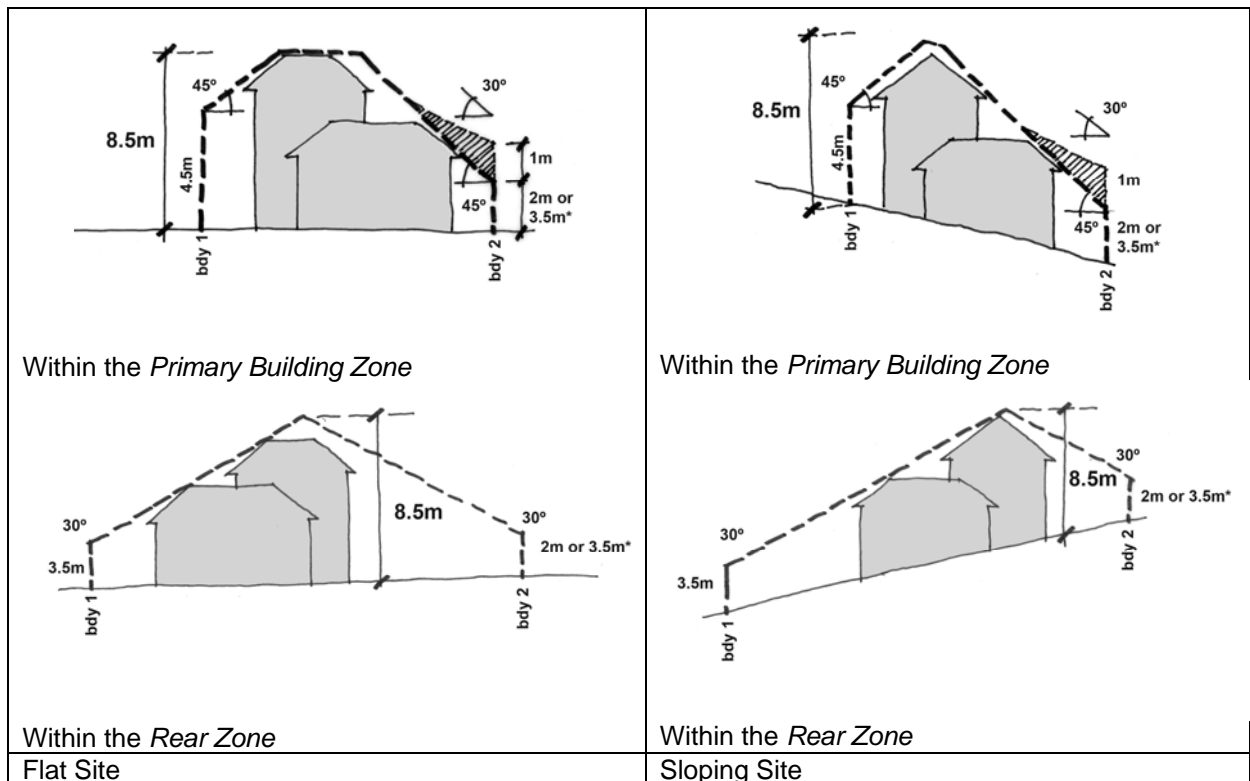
Typical building envelope - mid sized blocks approved before 5 July 2013 – except in Molonglo Valley
